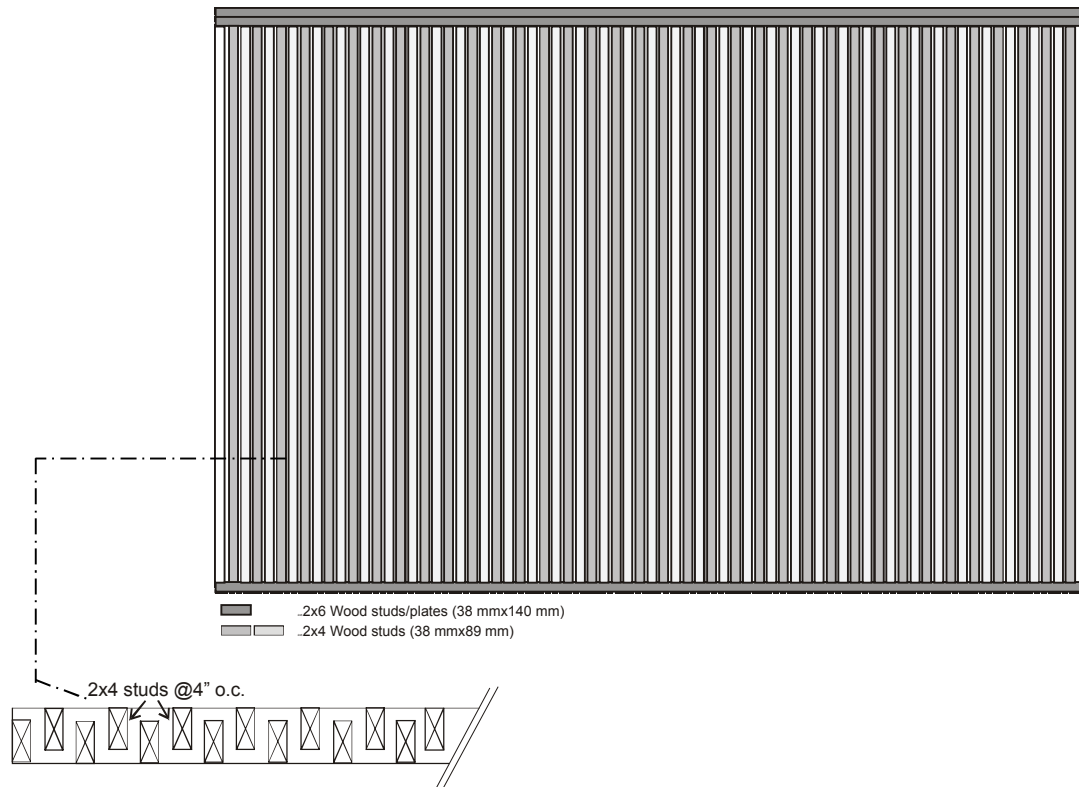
6: Framing – 2x4 staggered stud studs @ 100 mm (4'') o.c.
